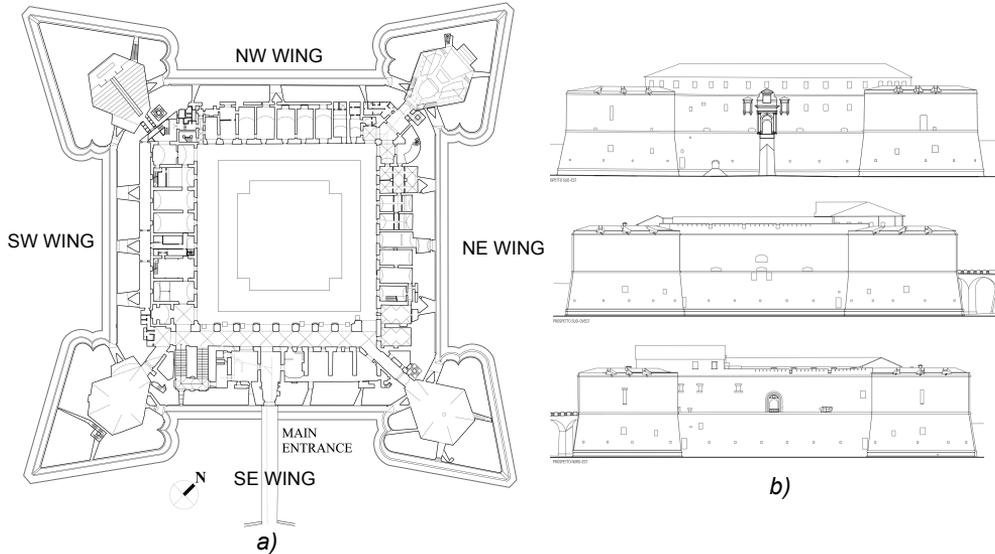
Geometric survey of the building: a) plan view and b) elevations
